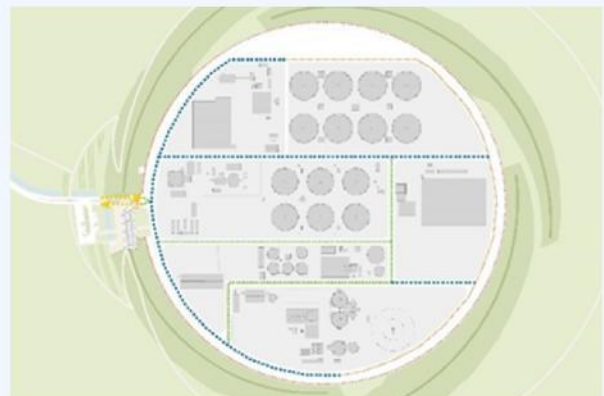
Layout zoned into primary uses of the Water Recycling Centre, Sludge Treatment Centre and Buildings.
